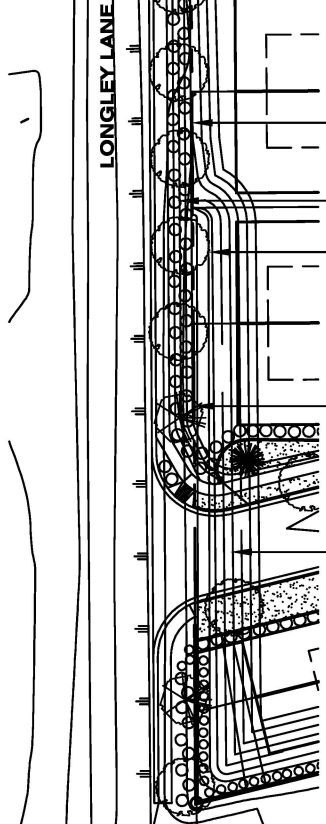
LONGLEY LANE STREETScape PLAN
